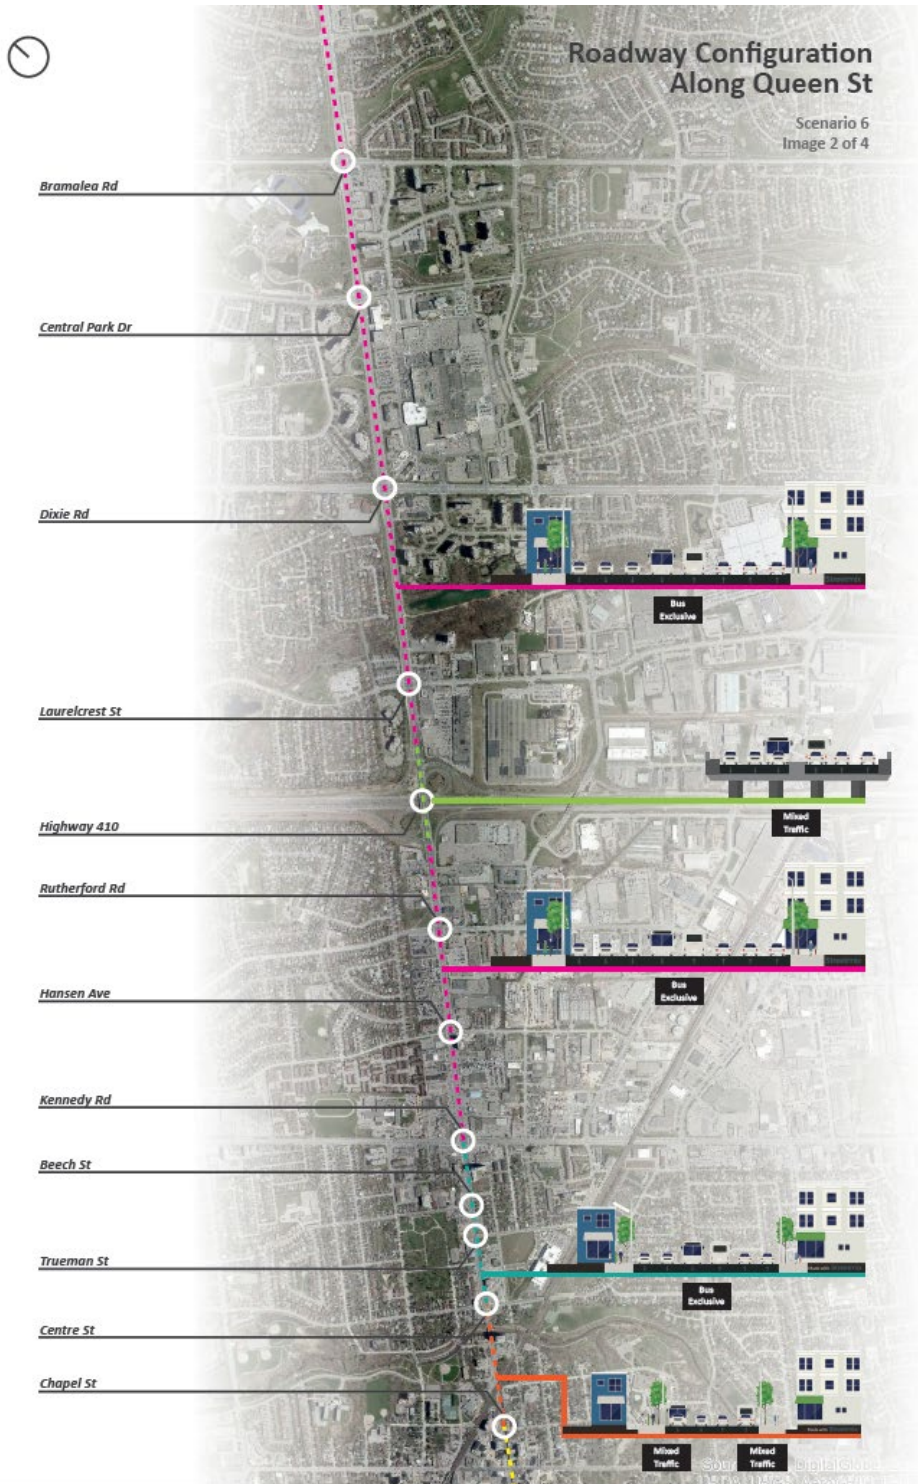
Scenario 6 road configuration, Chapel Street to Bramalea Road
